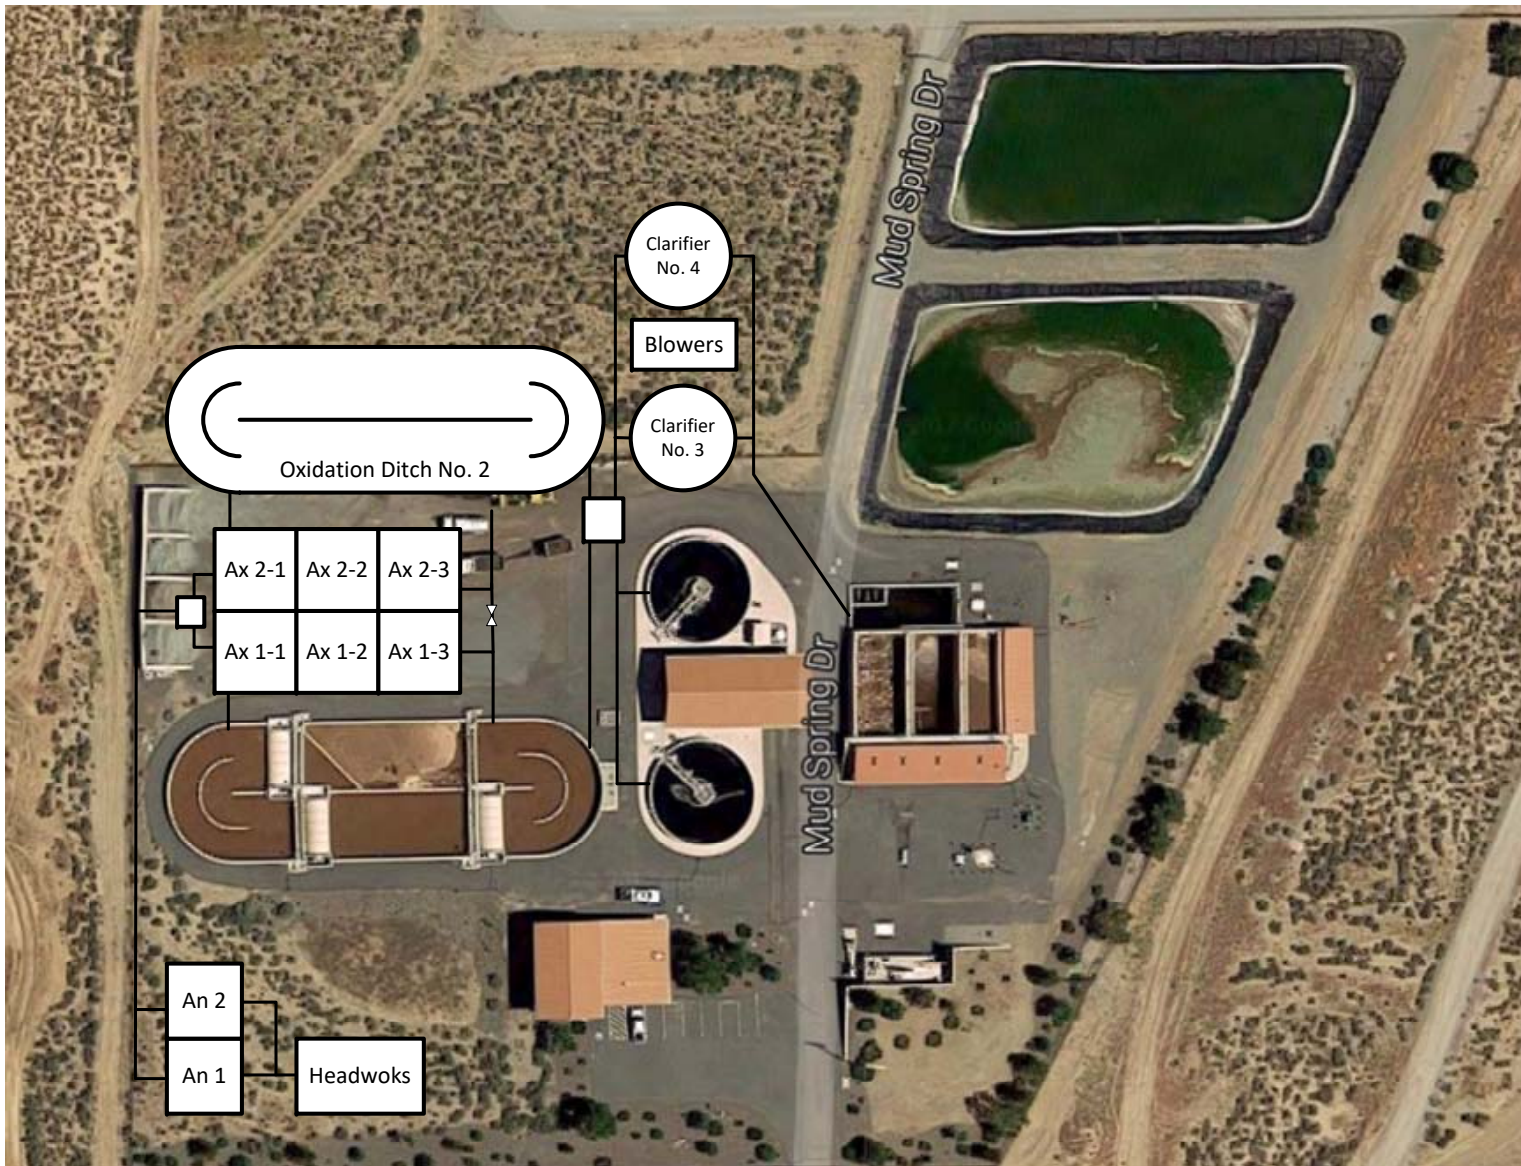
Option 2 – A2O Process – Site Layout with Headwoks
